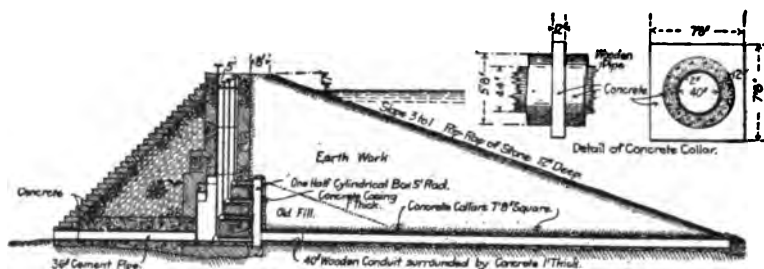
CASTLEWOOD DAM, COLO. SECTION AFTER RECONSTRUCTION.
